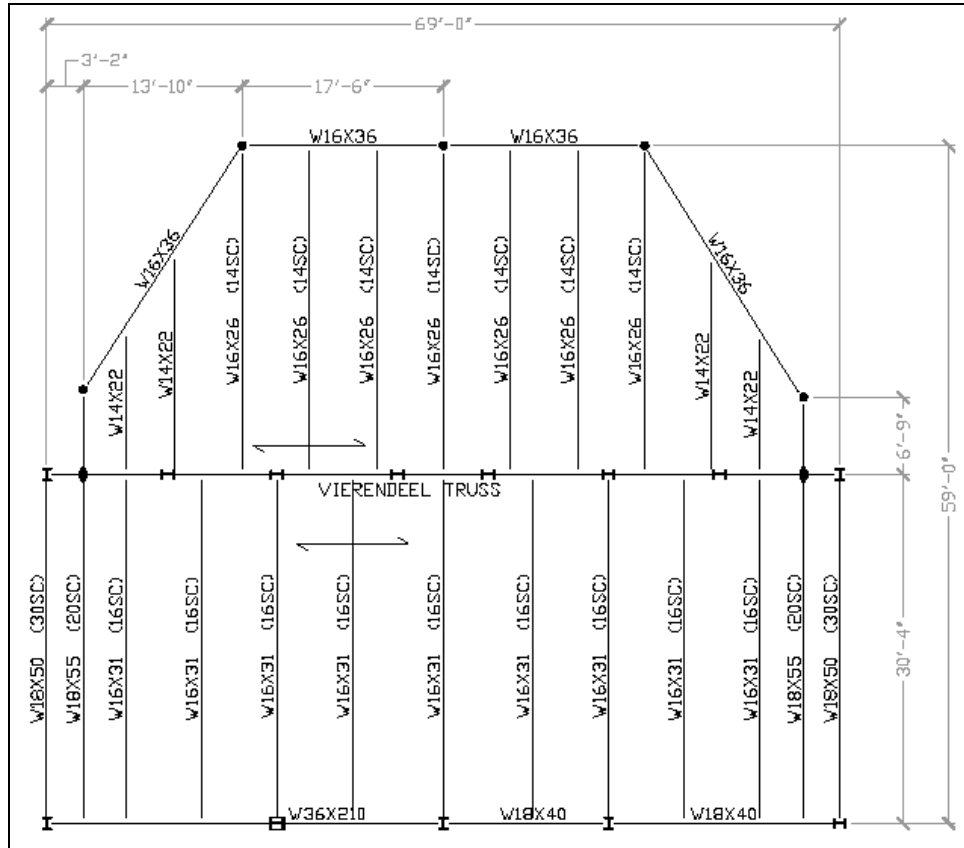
Partial 2nd Floor Framing Plan – Existing System
